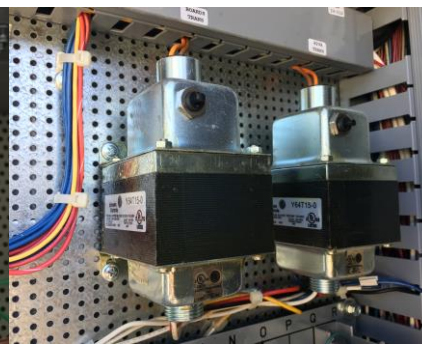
Foot and Hub Mount Transformers with Circuit Breaker
